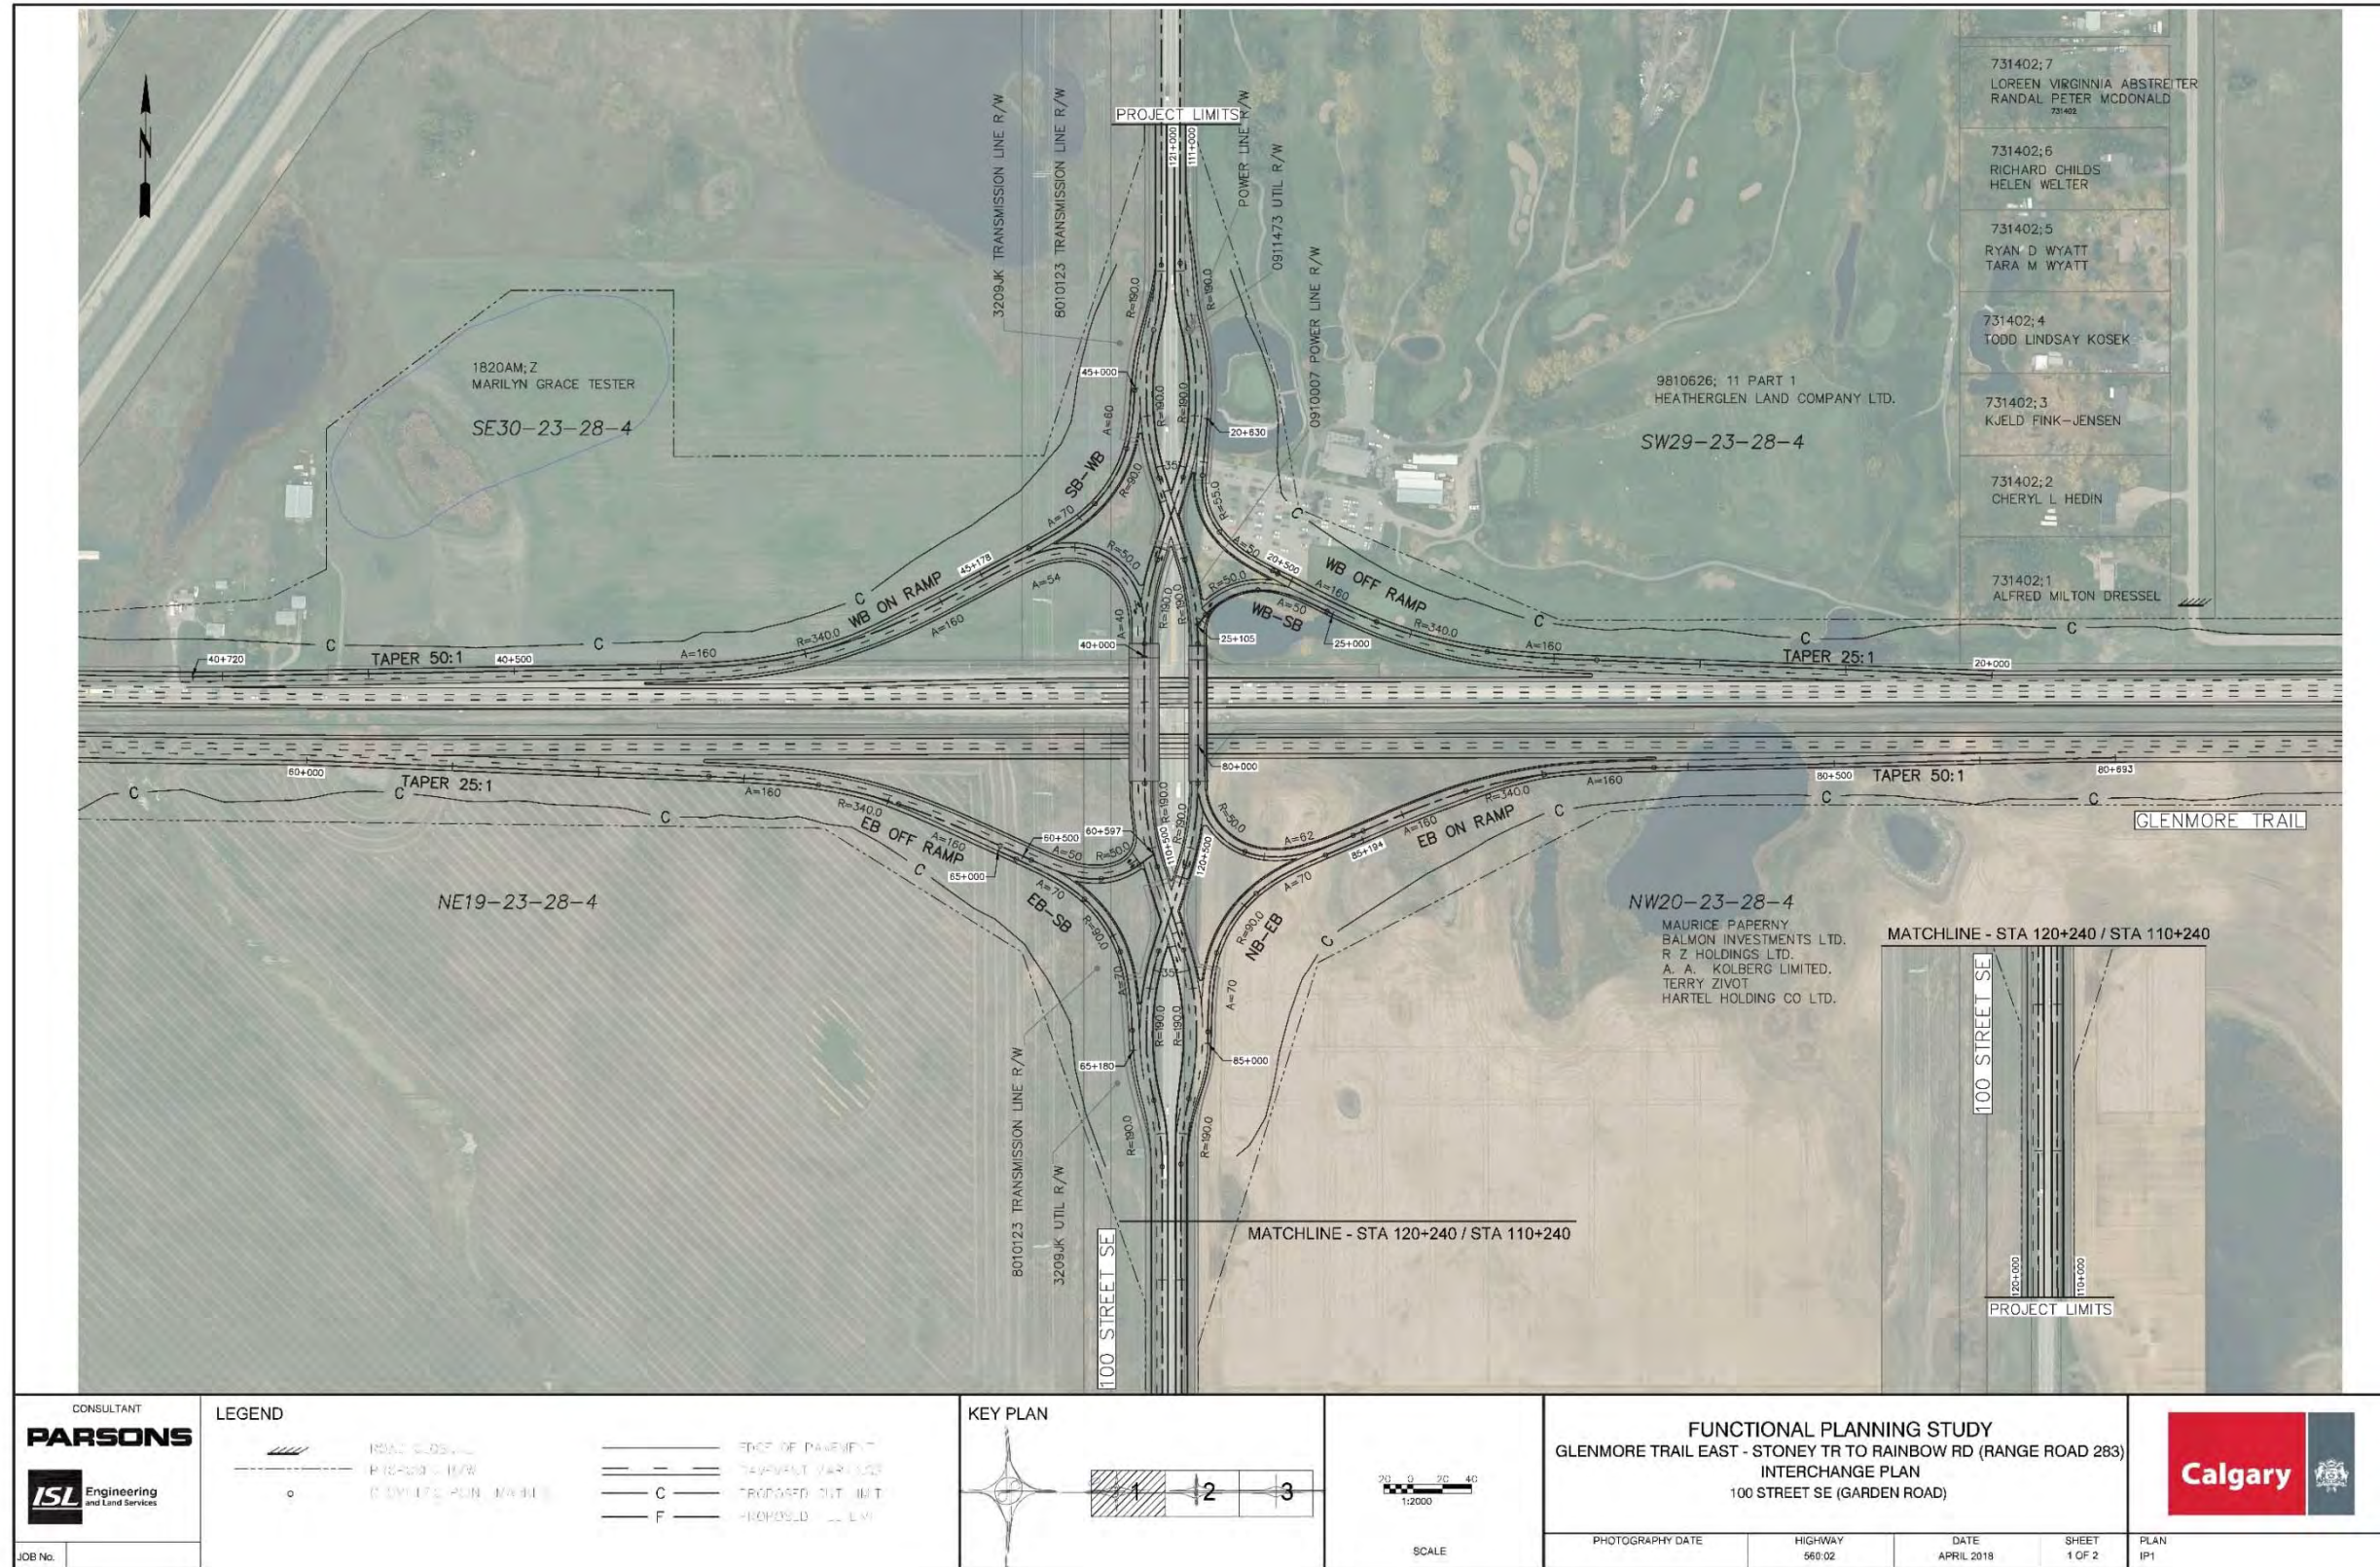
RECOMMENDED PLAN - 100 ST SE
